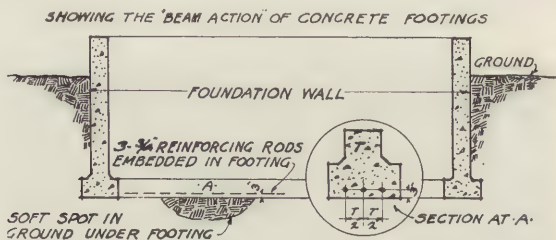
How reinforcing can be used to bridge over soft spots.
